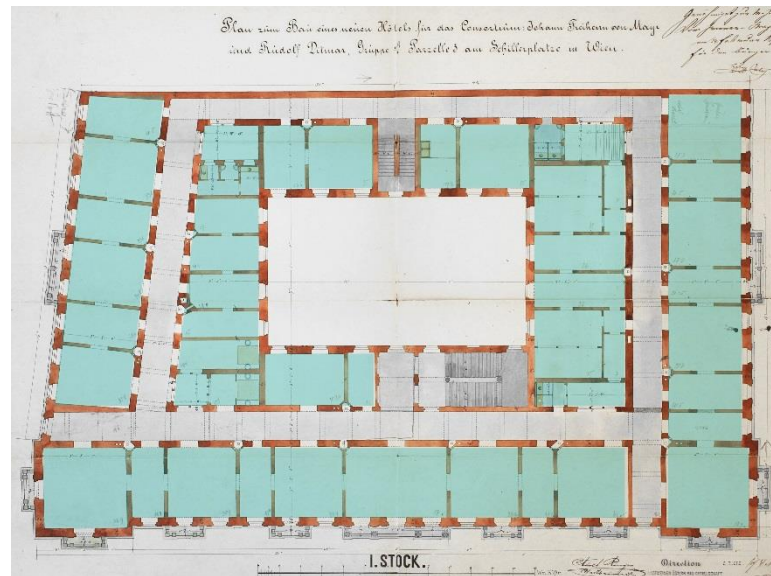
Typical floor plan, the conditioned area is highlighted
